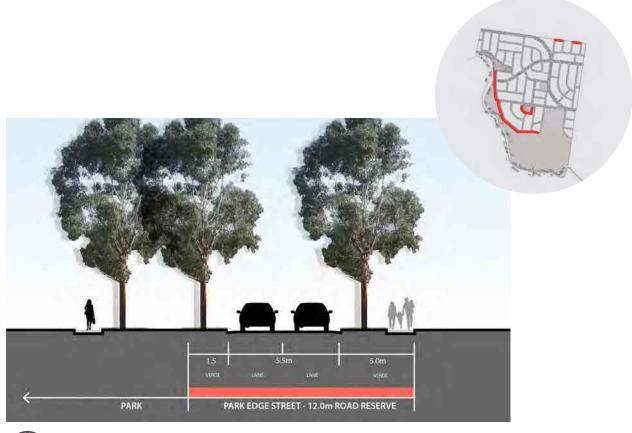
Park Edge/River Boulevard Type 1 1:200
